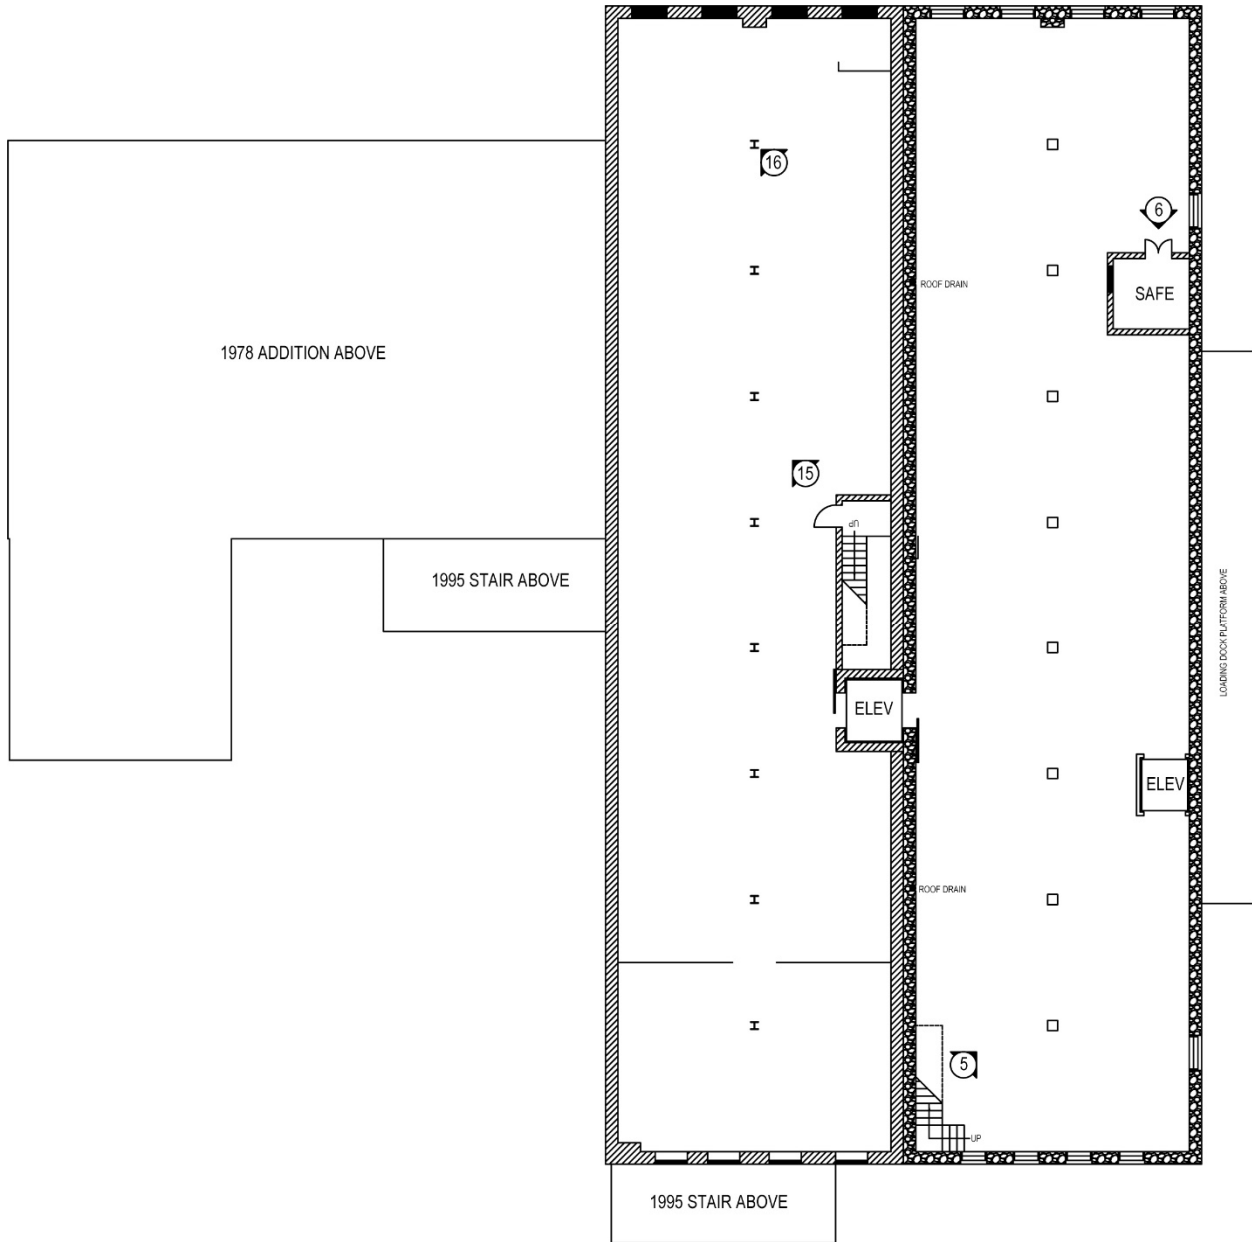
Basement Floor Plan with Photo Locations (not to scale) ↑
